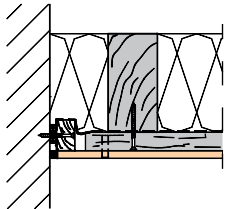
Roof to wall junction. Leave a 5 mm gap between the fermacell ceiling and other building substrates. This can be filled using a flexible decorators filler prior to the application of fermacell FST.
